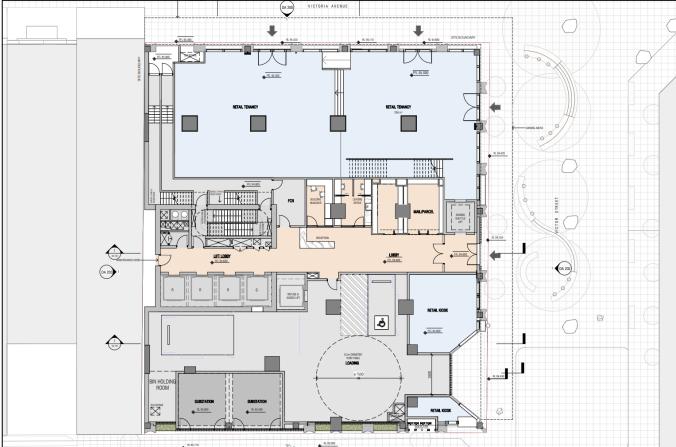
| Proposed site plan (top), ground floor layout (above) and photomontages of Victor Street / Victoria Avenue and Victor Street / Post Office Lane facades (over the page) (source: Applicant's RtS)
